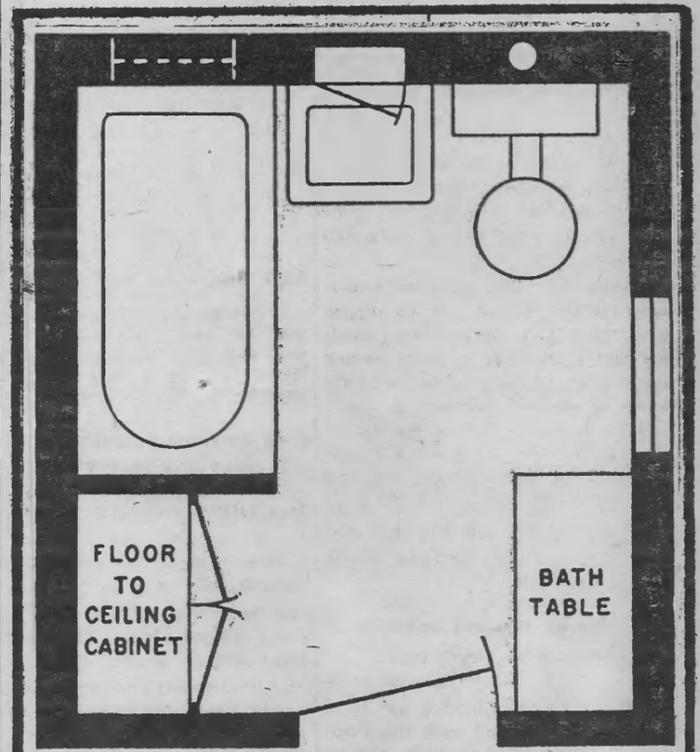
Bathroom 7 by 8 feet has plenty of space for dressing and for baby bath table.
